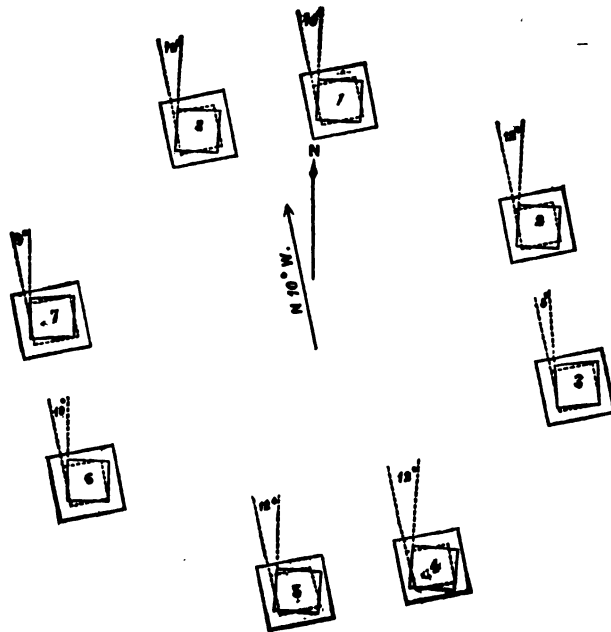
Plan of pillars of thermometer shed at Dhubri.
